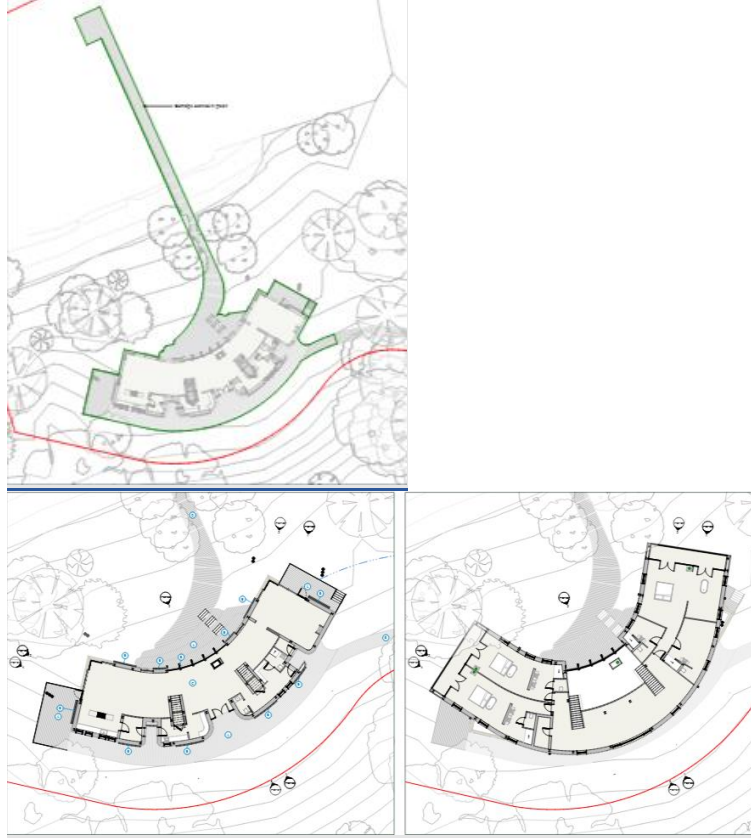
Proposed Lodge Site Plan and Lower/Upper Floor Plans – plans showing the proposed lodge development
